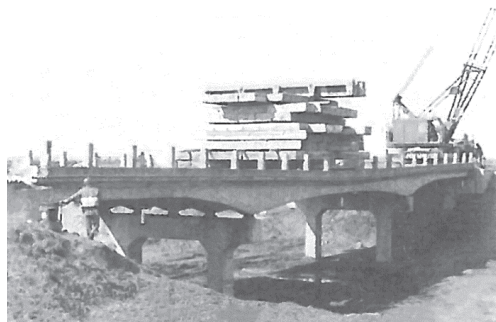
The Lethbridge Bridge illustrating loading procedure for testing (Scanlon & Mikhailovsky 1987).
